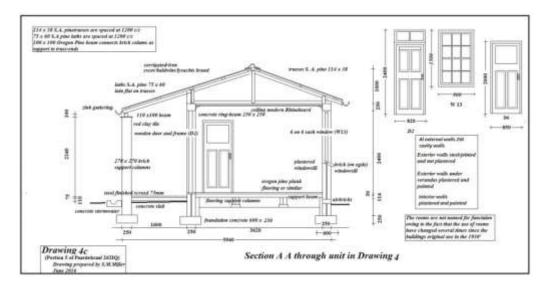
Above. Section A -A through unit in Drawing 4. (Drawing S.M. Miller 2016.)
